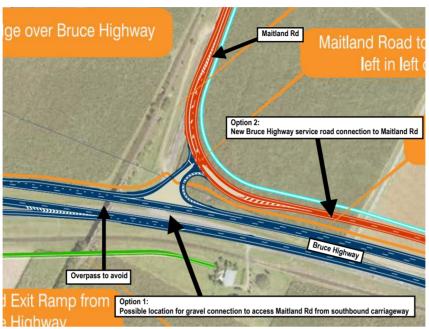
Under-construction Bruce Highway / Maitland Rd upgrade works
